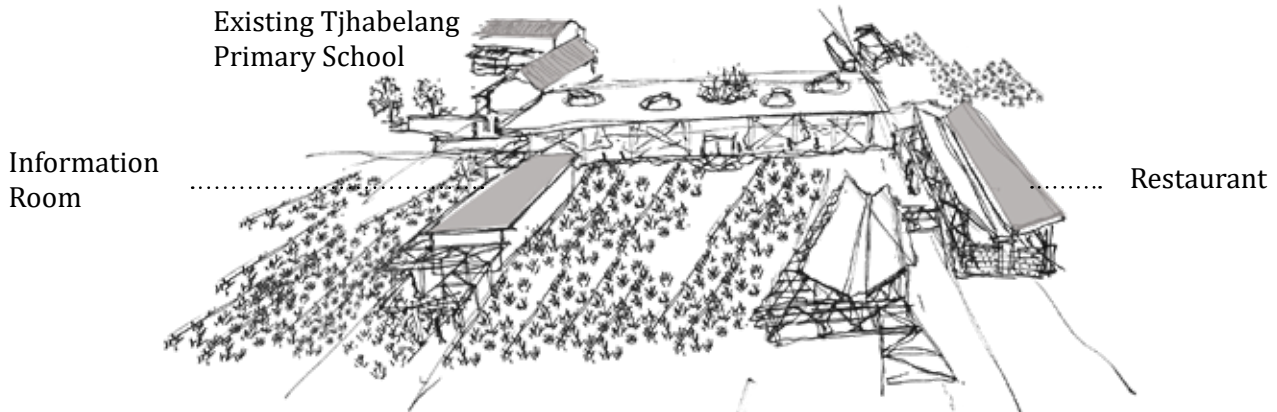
3D illustrating steel constructed roofs with corrugated iron sheeting (Caldeira, 2019: drawing).
